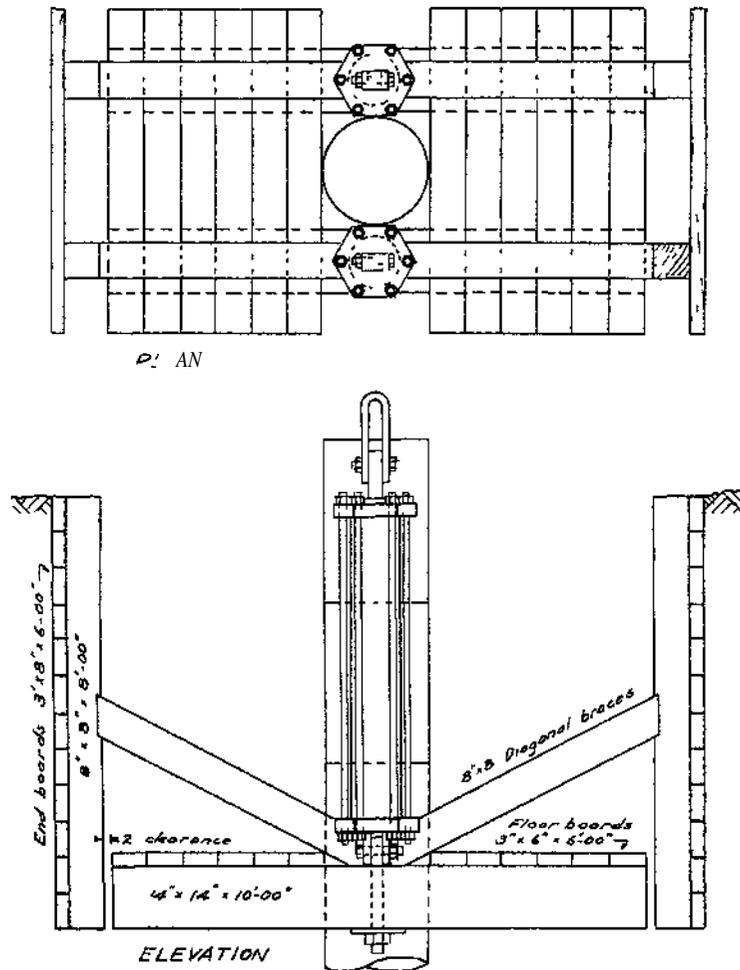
Installation of hydraulic jacks with end walls and diagonal bracing for heavy duty. Some drillers use heavy angle irons for the diagonal or end braces.
